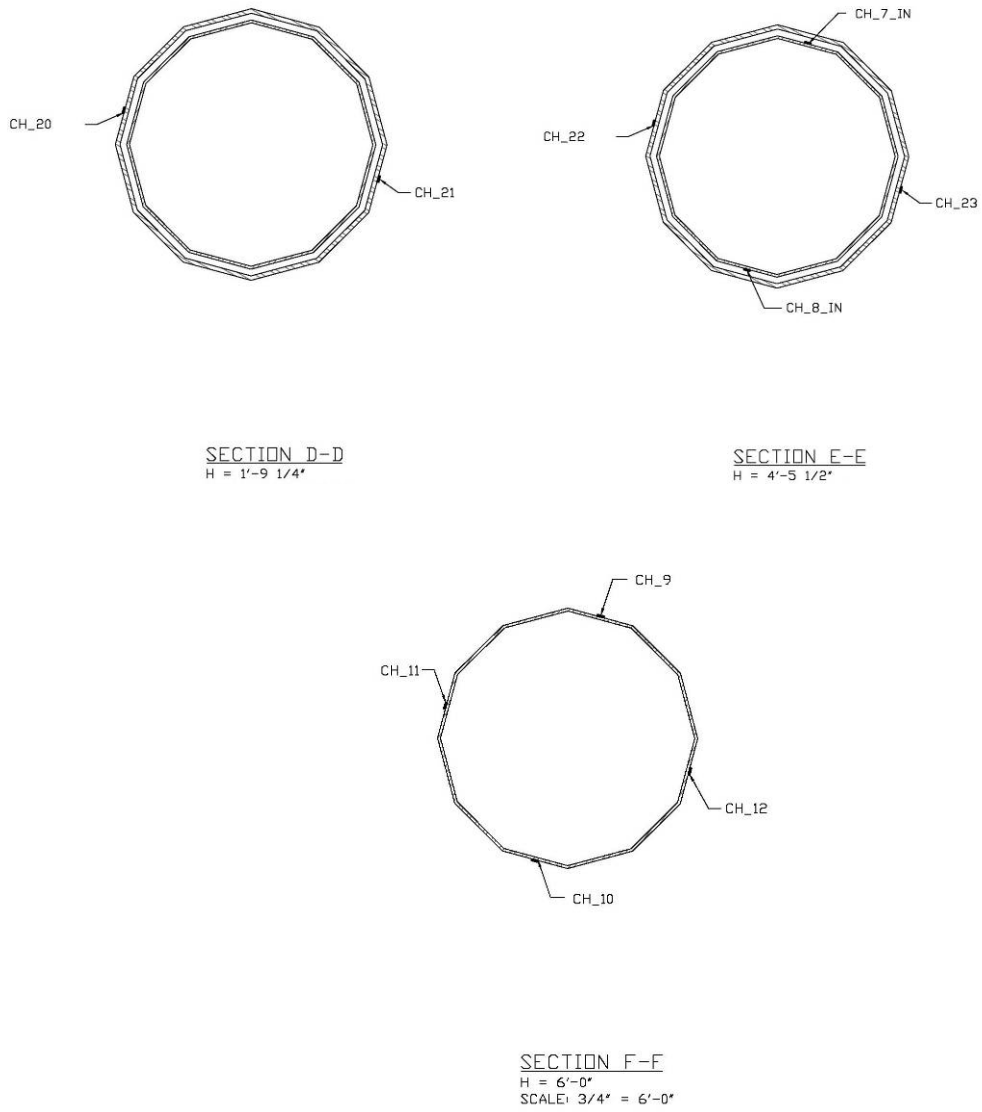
Section drawings showing strain gage locations (part 2/2)
